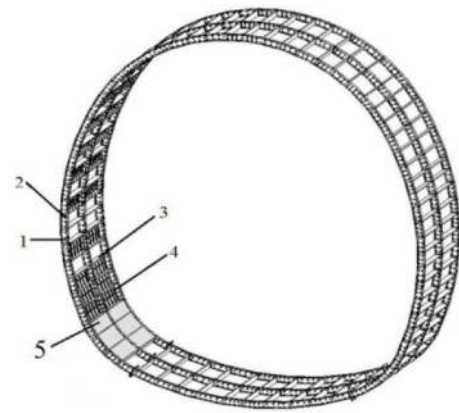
Schematic of SRSC composite structure support system (1-steel arch, 2-stud, 3- longitudinal connection plate, 4- U-shaped steel, 5-Shotcrete).
